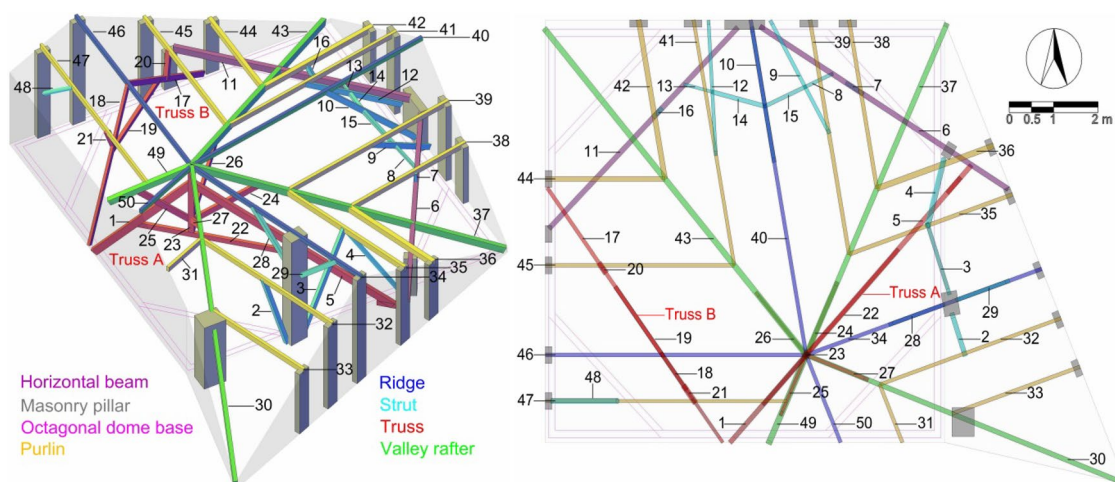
3D modelling and horizontal blueprint of the carpentries set above the octagonal dome in the Knights’ Hall. King-post truss (Truss A) and A-shaped truss (Truss B)
